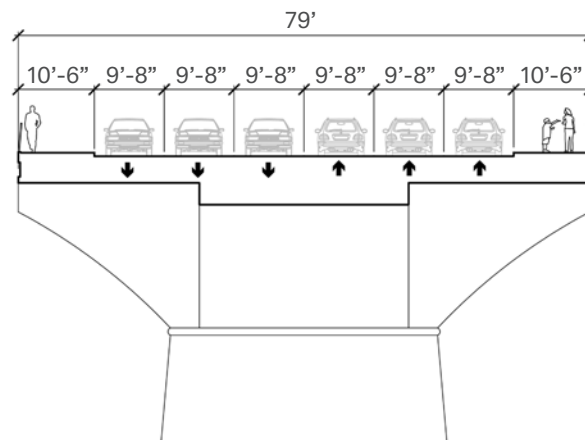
Section A-A': Existing conditions of Ann W. Richards Congress Avenue Bridge
